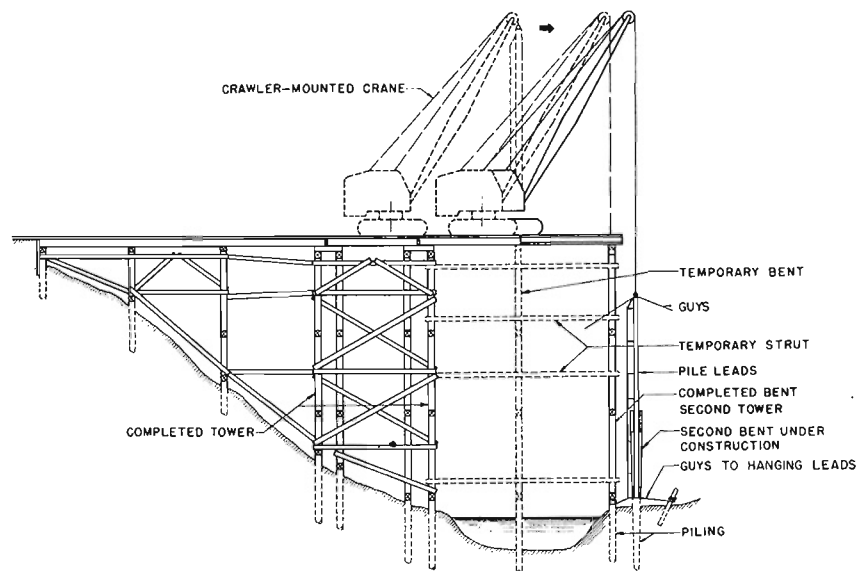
Crawler-mounted crane operating over falsework to drive piling and erect timber tower for long span.
